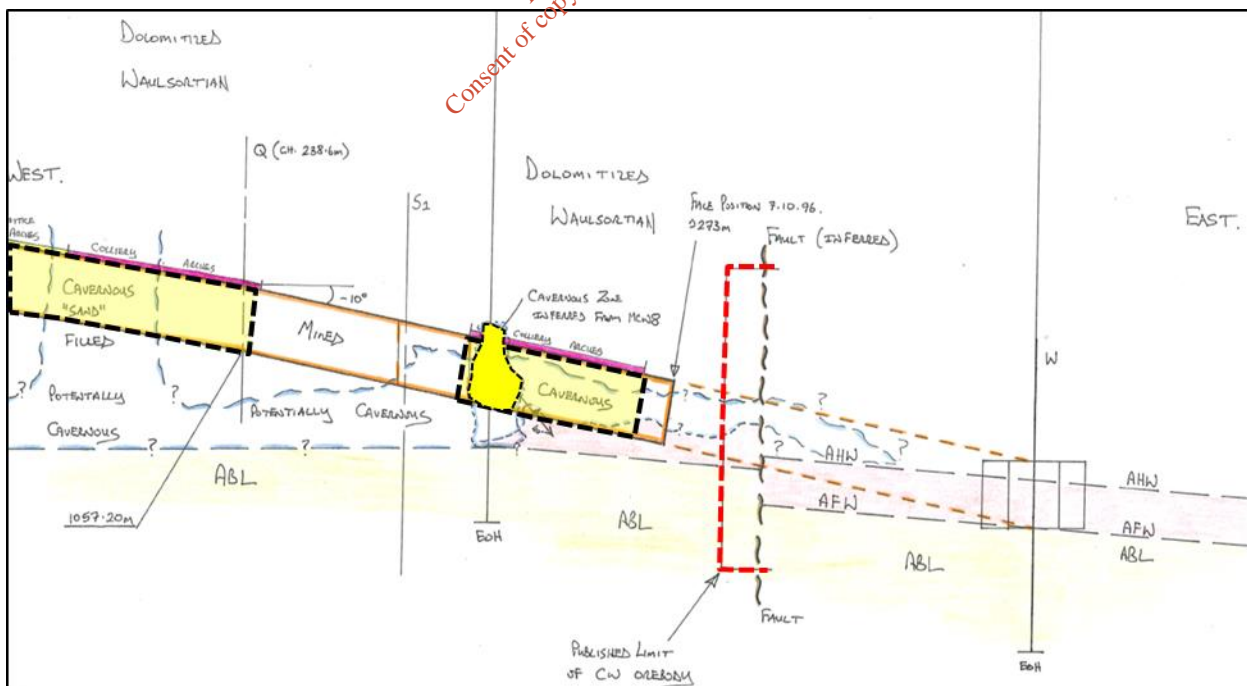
Cross-section No. 1 Access Decline looking north, showing intersected ground conditions on 7th October 1996. Areas in yellow denote extent of intersected fissure zones as shown in Figure 12
